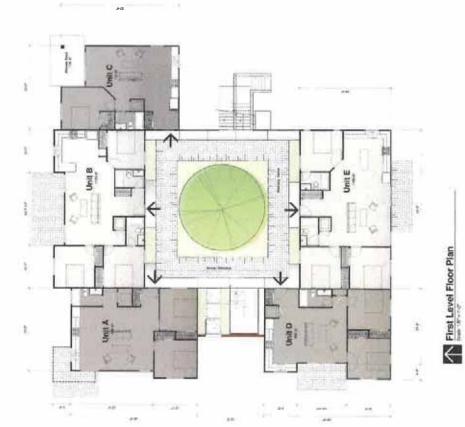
Exhibit C Floor Plans PD 16-003 (Webb Apartments)
